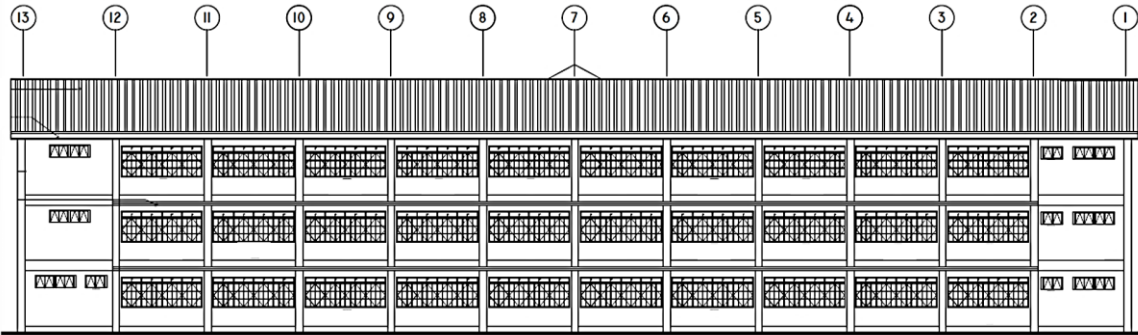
Elevation view of 3-storey, 15-classroom school (DepED, 2012)
